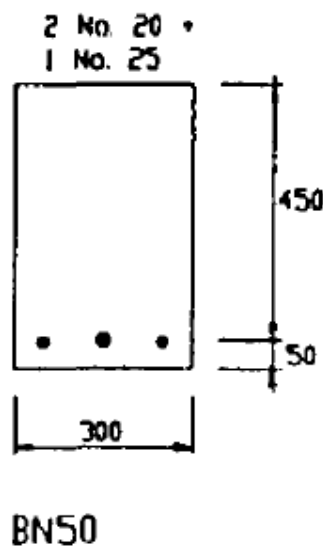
Cross sectional detailing of bond experiment (Stanik, 1998)
